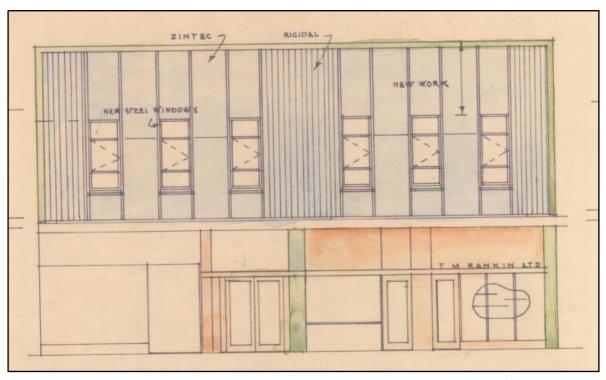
Detail from 1962 plan, showing alterations to the street façade of Watson's building at 8-14 Tay Street (Barham & Barham, 1962).
